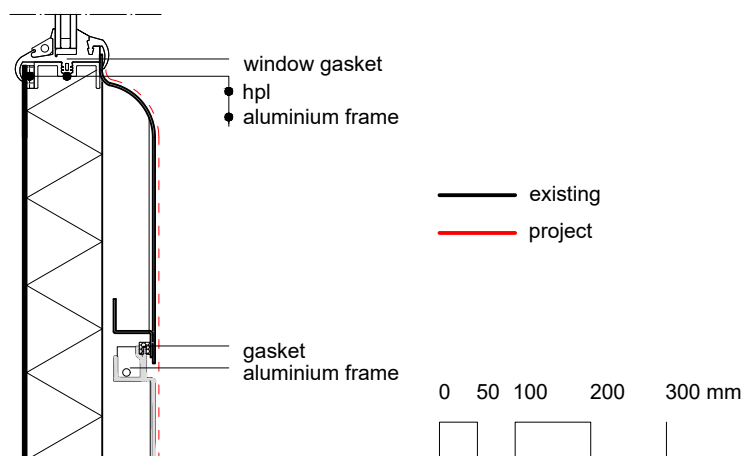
Vertical section of the façade of Briefzentrum Zürich-Mülligen showing the window frame and the aluminium attachment frame. Scale 1:10. Drawing after Theo Hotz and Geilinger AG, elaboration by the author.
